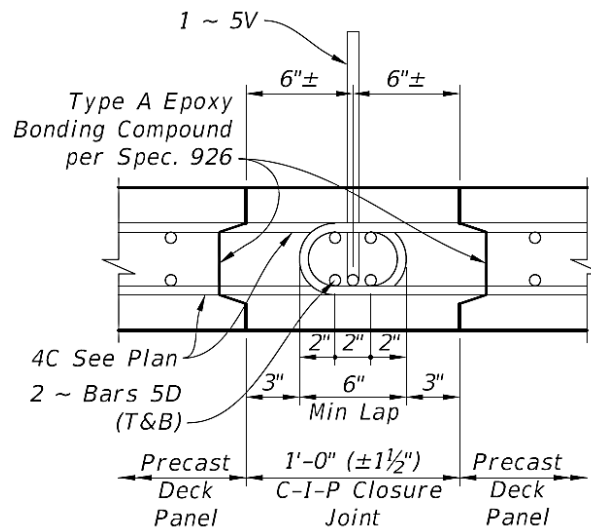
Schematic of conventional concrete longitudinal joint over girder
